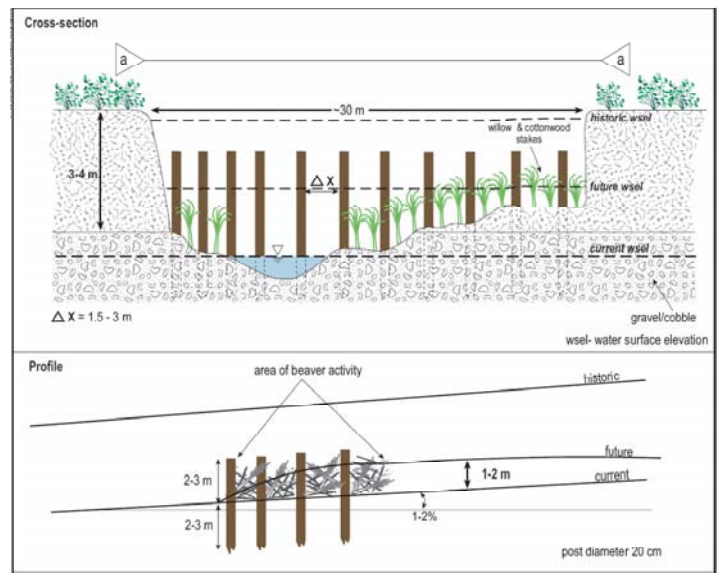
Schematic of a post-pile fence design to facilitate beaver dam construction—another “soft engineering” approach for causing aggradation of an incised stream bed.
